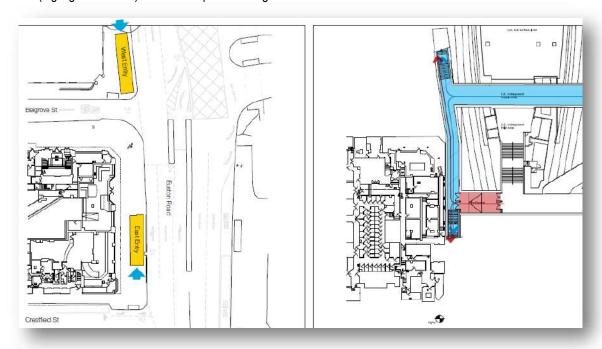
Existing London Underground - Ground Floor and Basement plans
